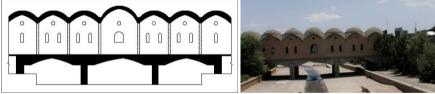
Section of Square Bridge and the view. (D, Rostamzade)
